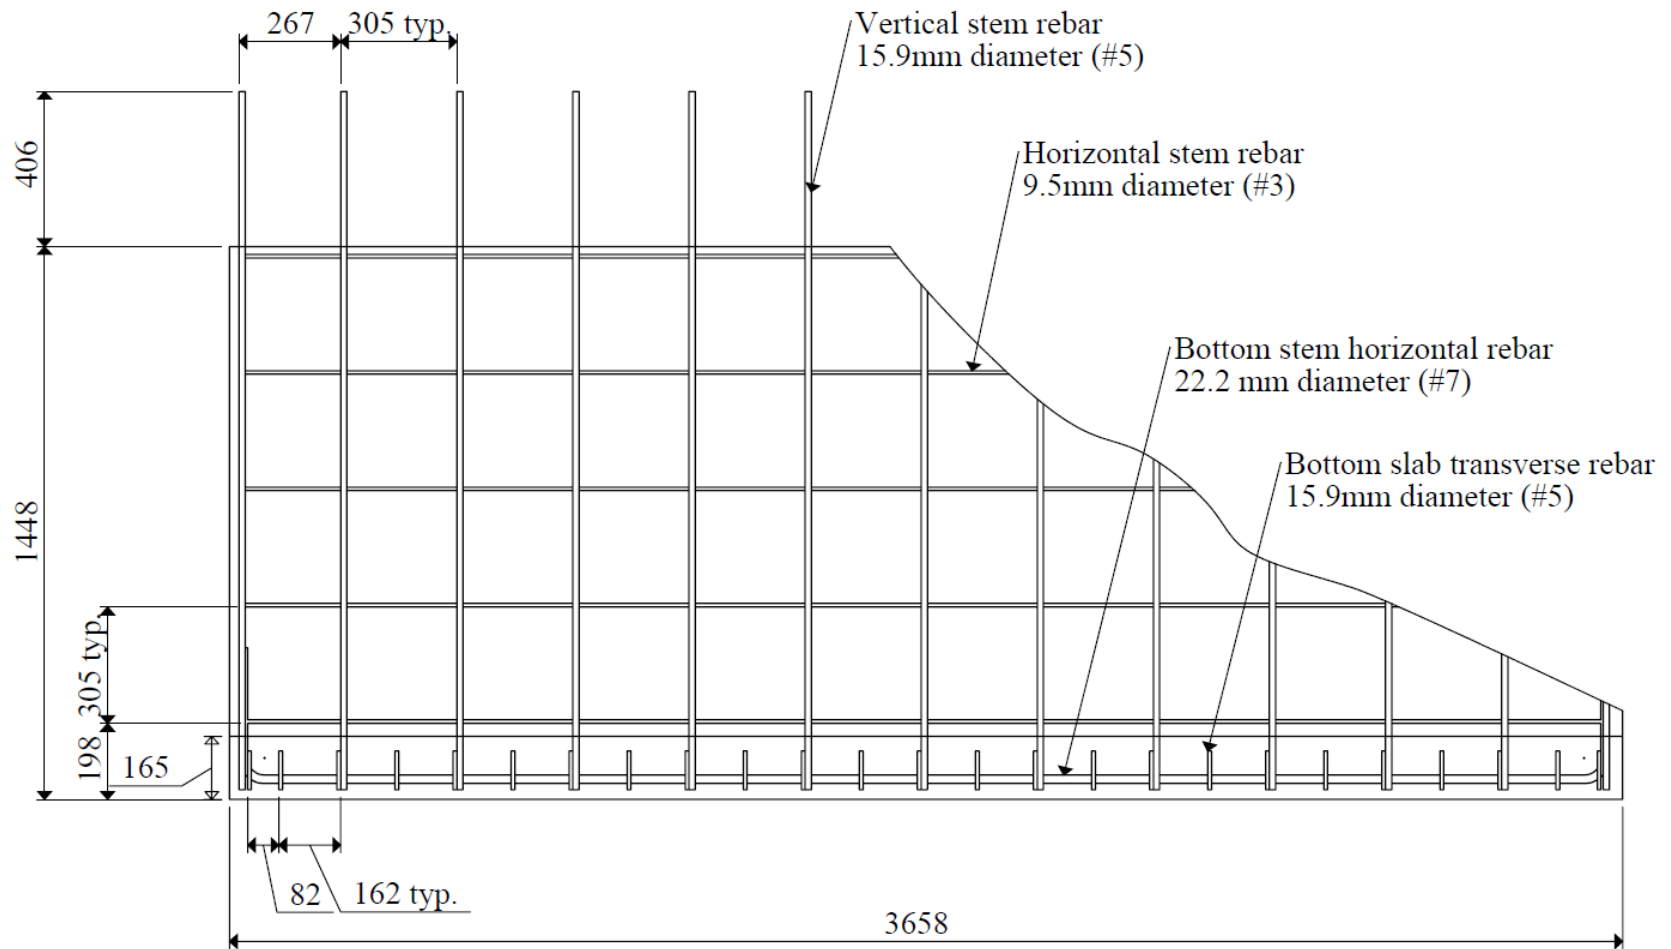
Steel reinforcement detailing in lower portion of box girder-side elevation view
